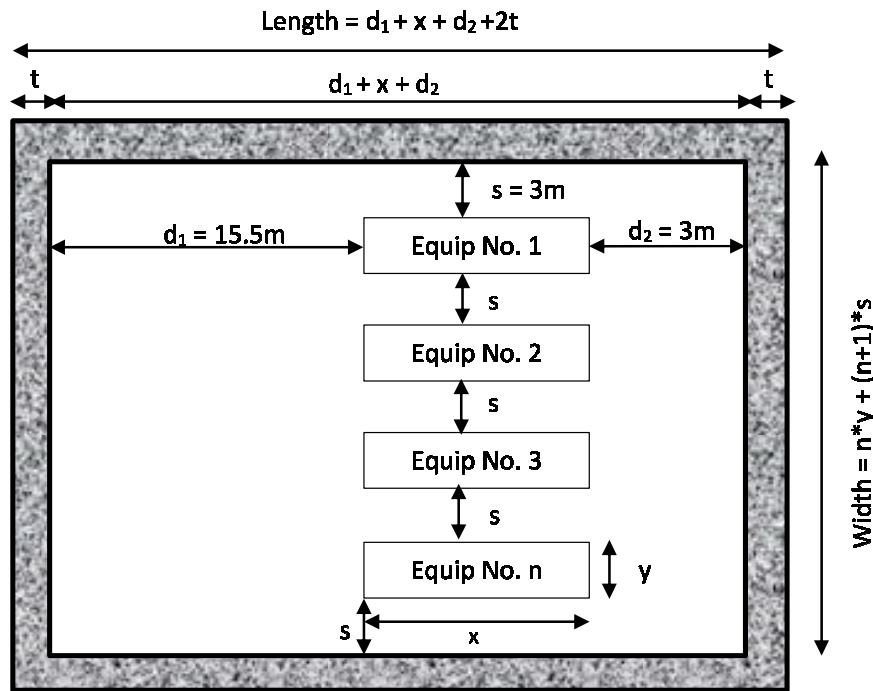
Approach used in calculating building space requirement of individual equipment in the briquetting plant
